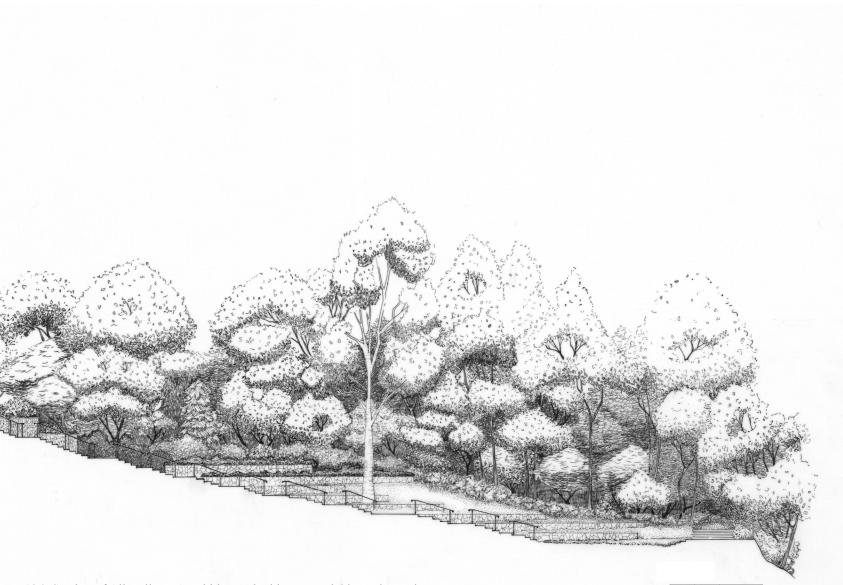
Section of All Hallows Amphitheater looking toward Olmsted Woods
